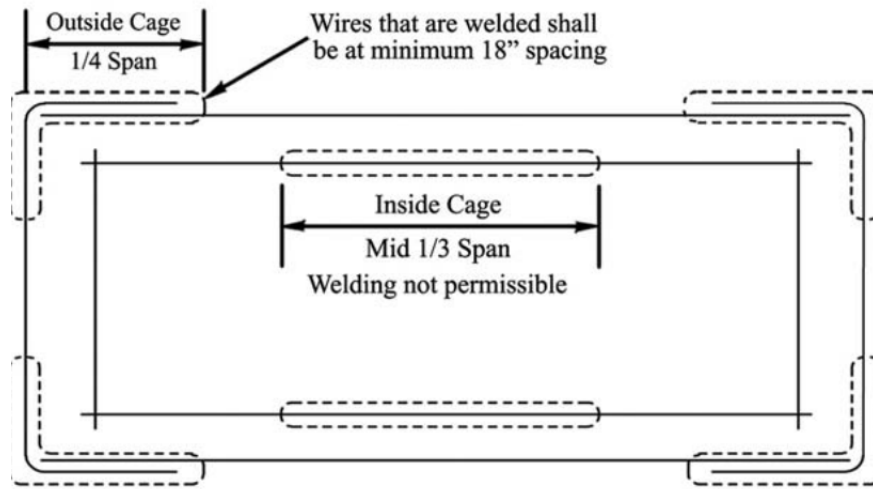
Restricted welding zones for box culverts.
